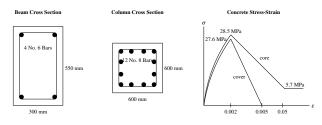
Beam and column cross-sections of reinforced concrete frame.
